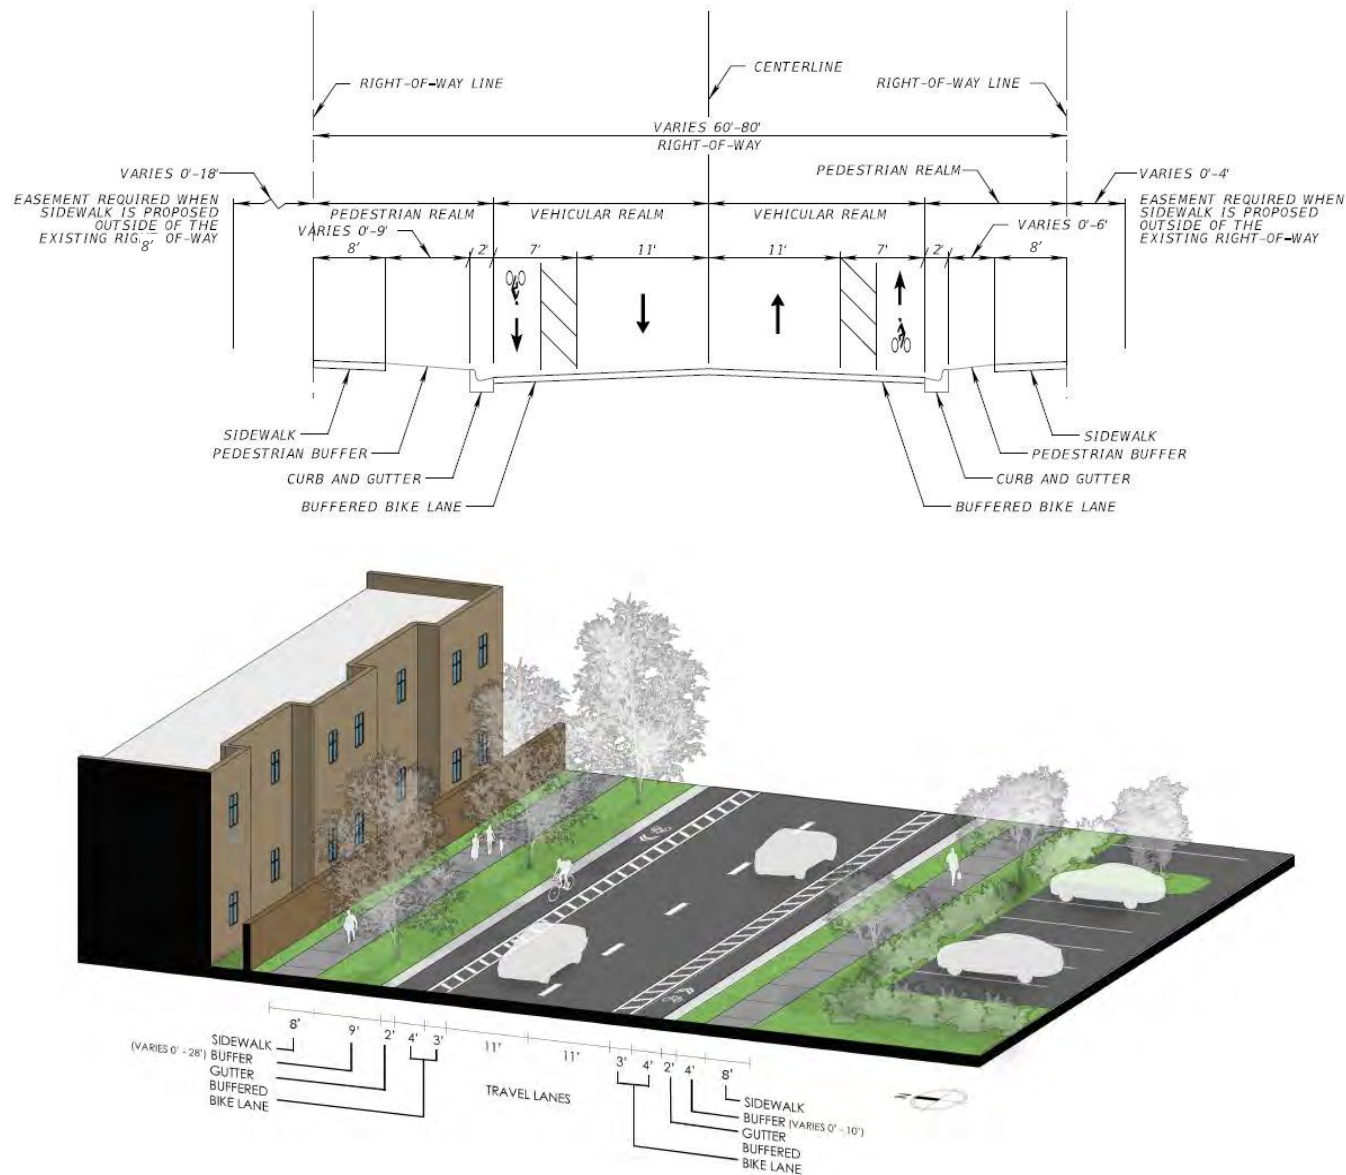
Civic Street - NW 151/NW 153 Street Proposed Concept (A-1)
